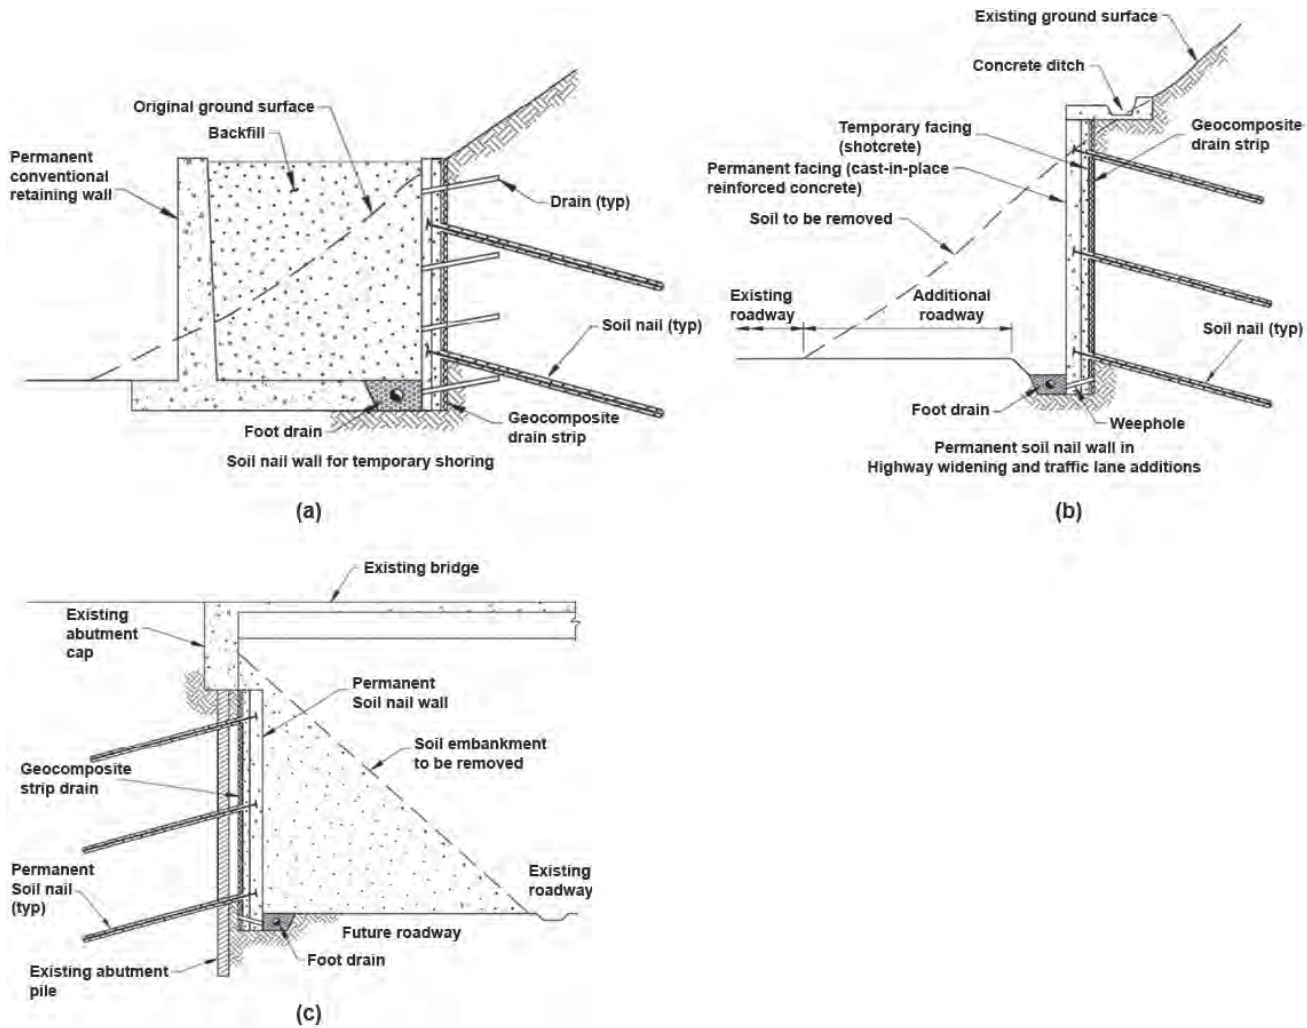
Examples of soil nailing: (a) temporary shoring, (b) roadway widening, and (c) end slope removal (Byrne et al., 1998).
